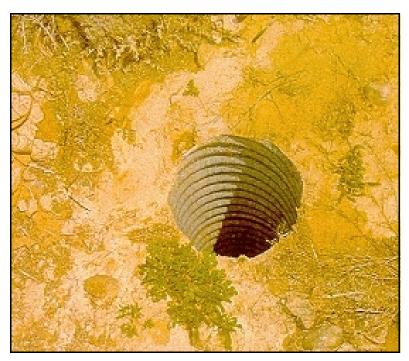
No intake structure exists for this outlet works. This conduit is prone to plugging with trash and debris.
